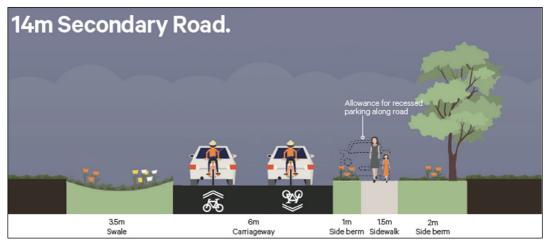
Proposed Cross Section – 14m – Road B, Road C and Road D
